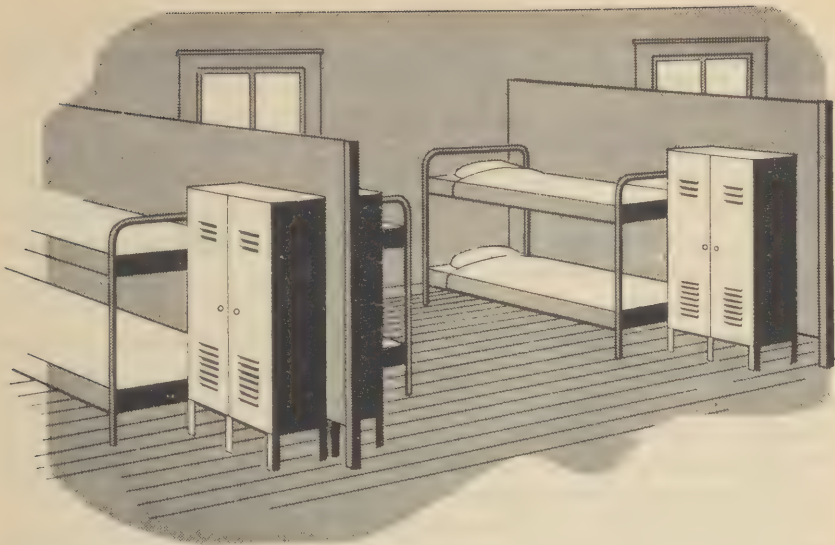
ARRANGEMENT OF DORMITORY CUBICLE RECOMMENDED BY THE BUREAU OF MEDICINE AND SURGERY FOR NAVAL BARRACKS. THIS CUBICLE IS REPRESENTATIVE OF THOSE SHOWN IN THE RECOMMENDED GENERAL FLOOR PLAN IN FIGURE 2-3.
